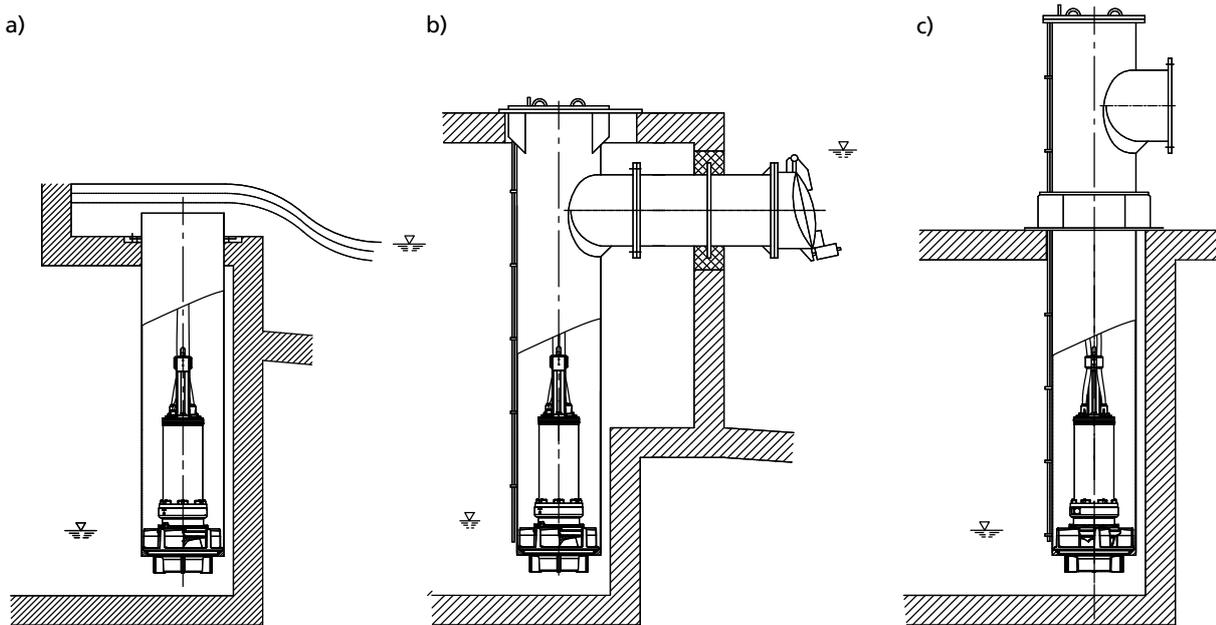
Overview of installation types a) Installation type BU (overflow design) b) Installation type CU (underfloor discharge) c) Installation type DU (above-floor discharge nozzle)
